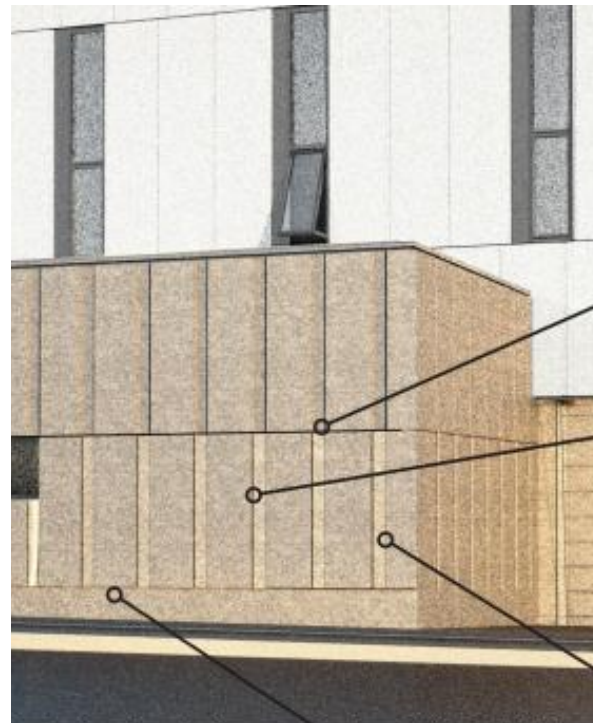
DETAILING – TYPICAL METAL PANEL & PRECAST
